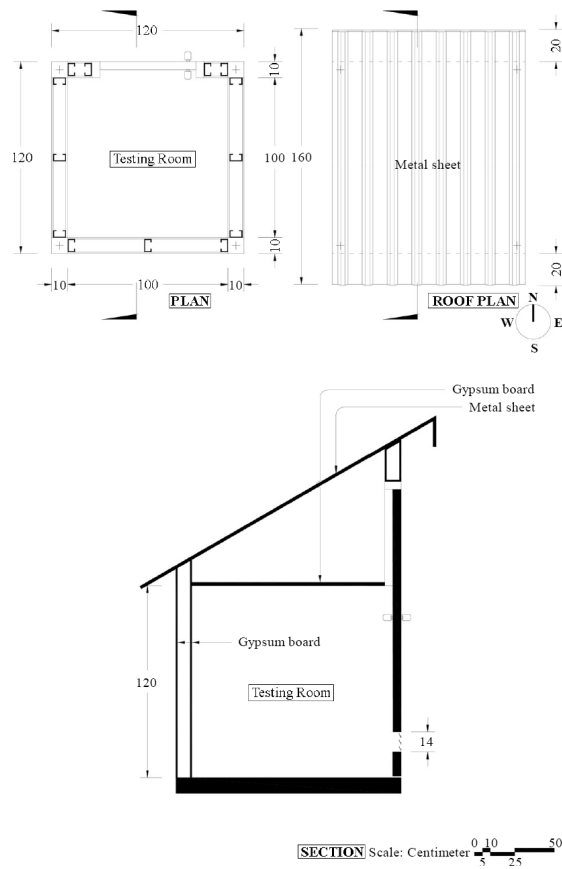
Show Model of the first house, Gypsum Wall (GW) tested together with Metal Sheet Roof (MSR)
